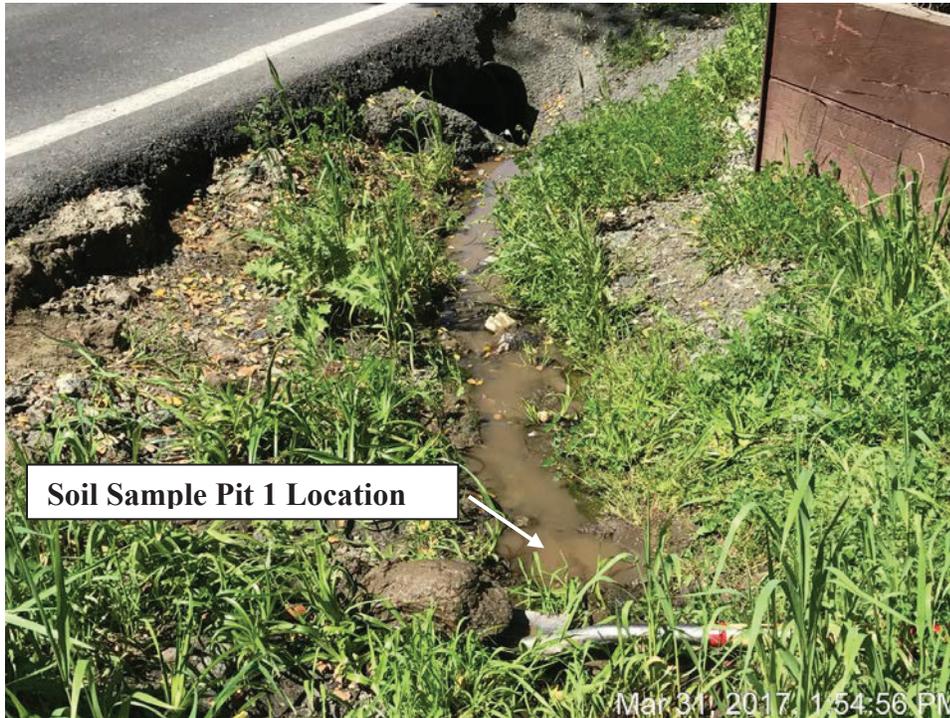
Soil Sample Pit 1 Location within Bed of Channel, Adjacent to Bollinger Canyon Road
